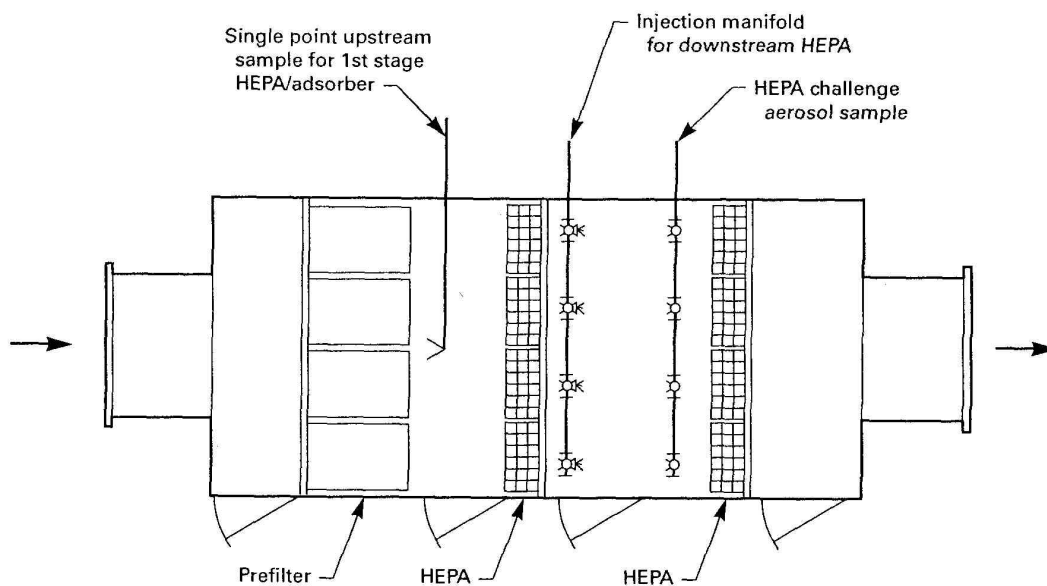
Common configurations requiring test manifolds (Plan A)
